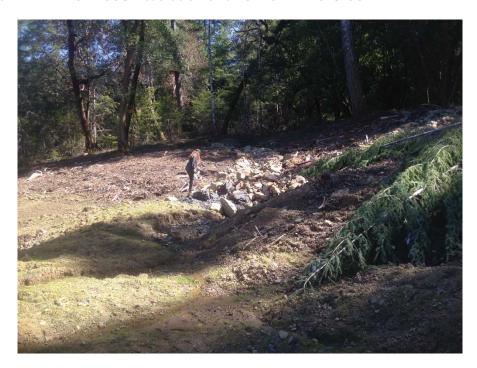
Cutslope above pond showing slope failure and fallen trees. Photo taken looking southeast on 4/4/18.
